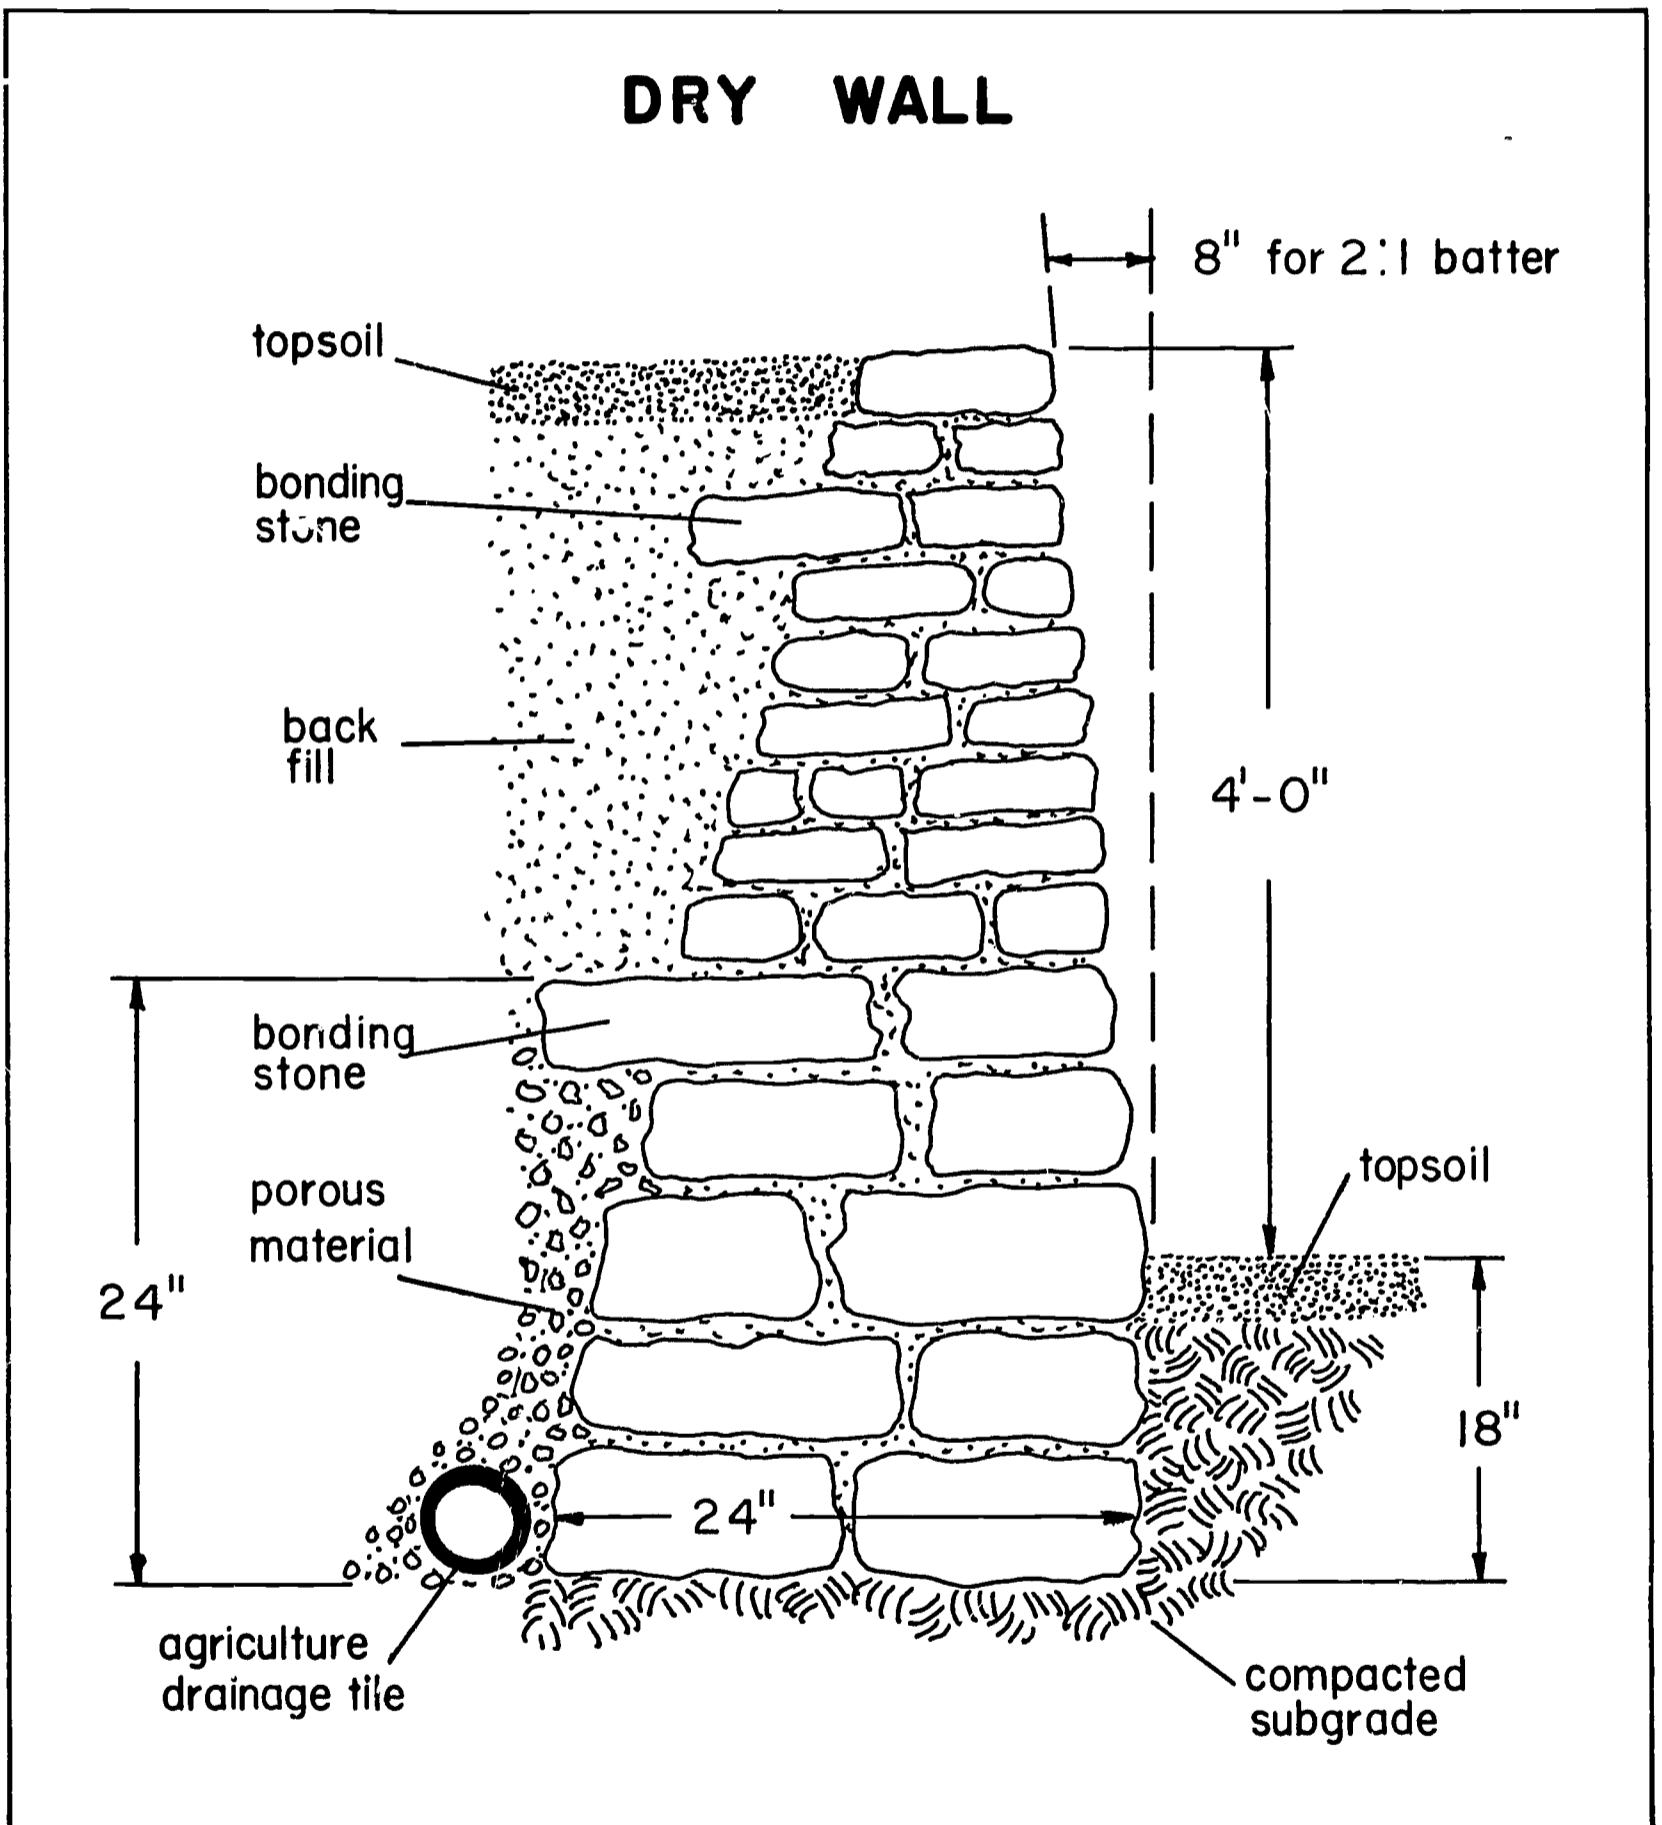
The base of a dry wall should be half as wide as the height of the wall; stones should slant slightly toward the rear; water must be drained from behind the wall.
